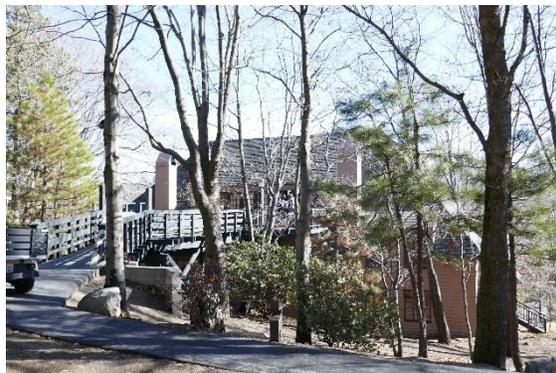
Bridge structure as it connects to the adjacent hillside, looking east.
